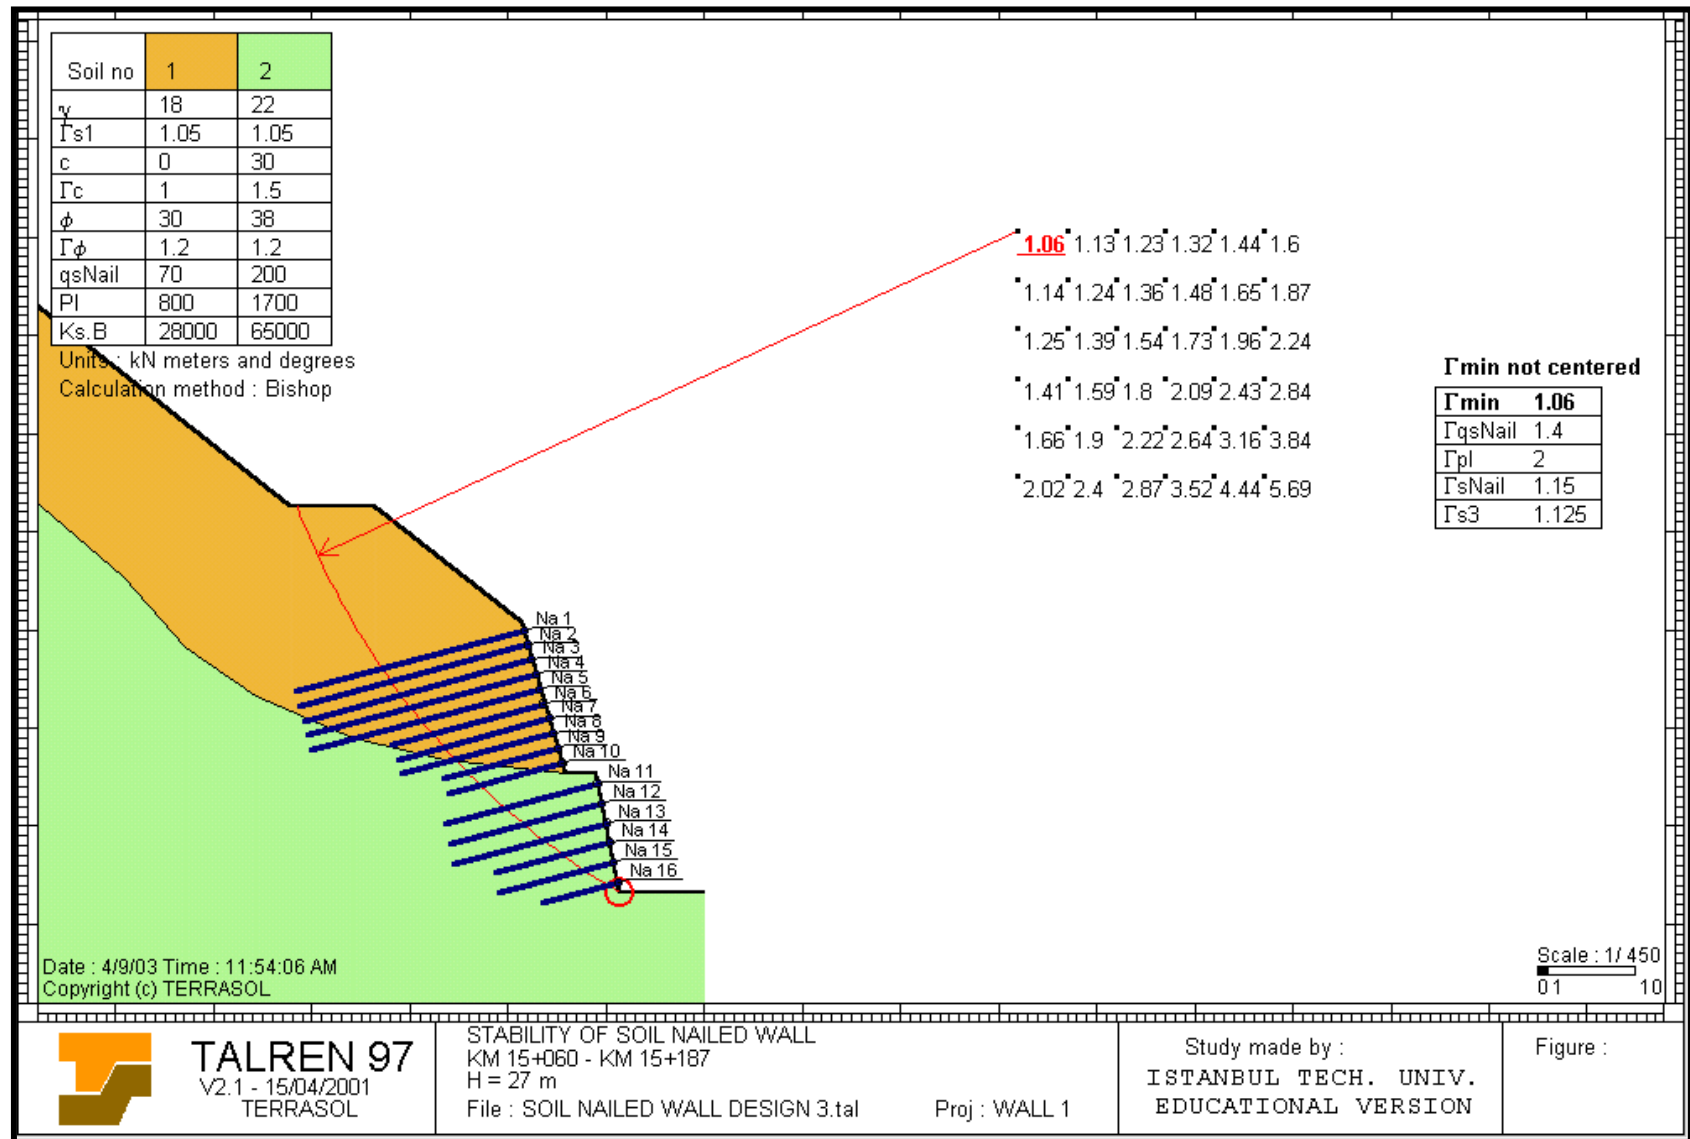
Third static design and stability analysis of the soil nailed wall with TALREN 97
